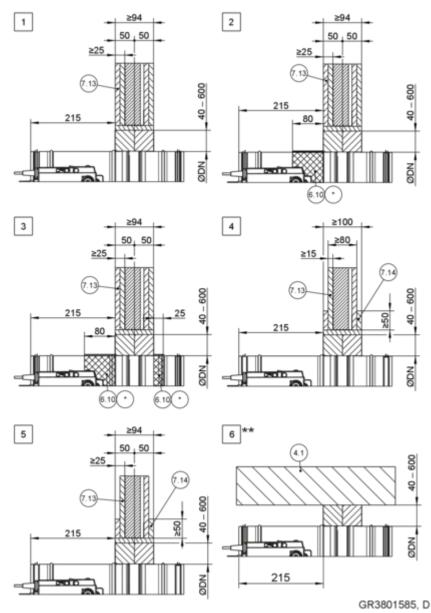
Dry mortarless installation into a lightweight partition wall, with a fire batt
